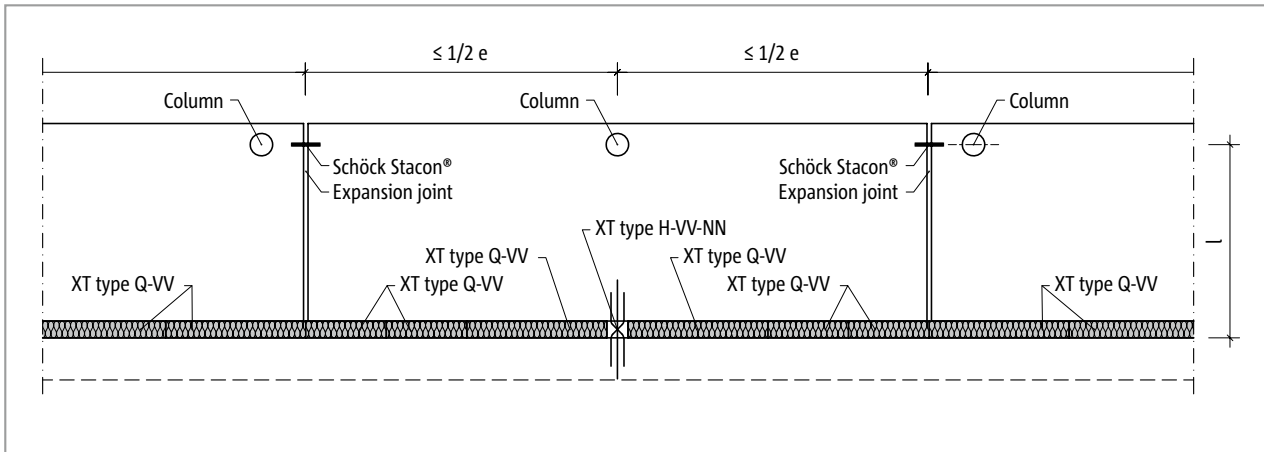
Schöck Isokorb® XT type H: Expansion joint arrangement
